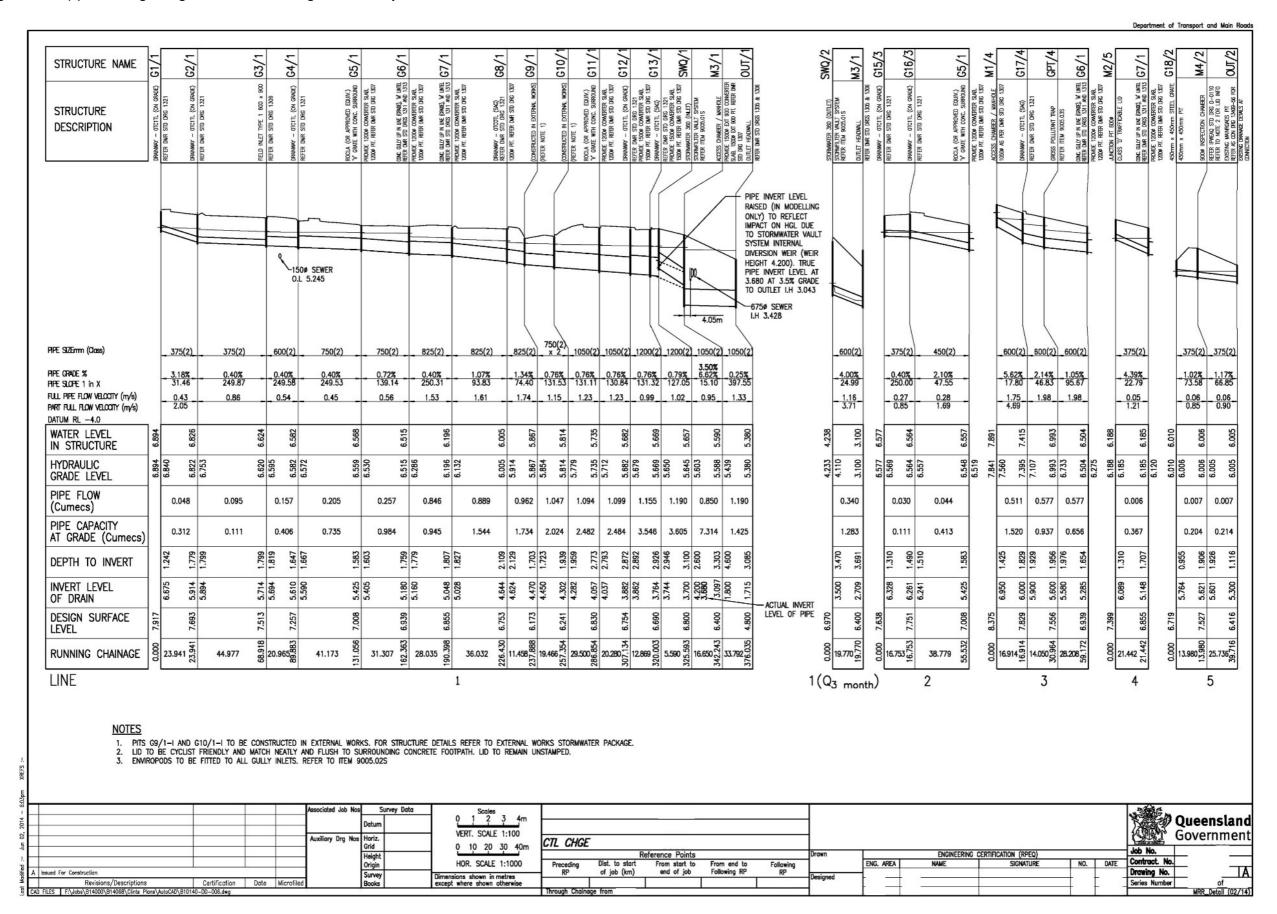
(b) – Drainage longitudinal sections – generic example 2
